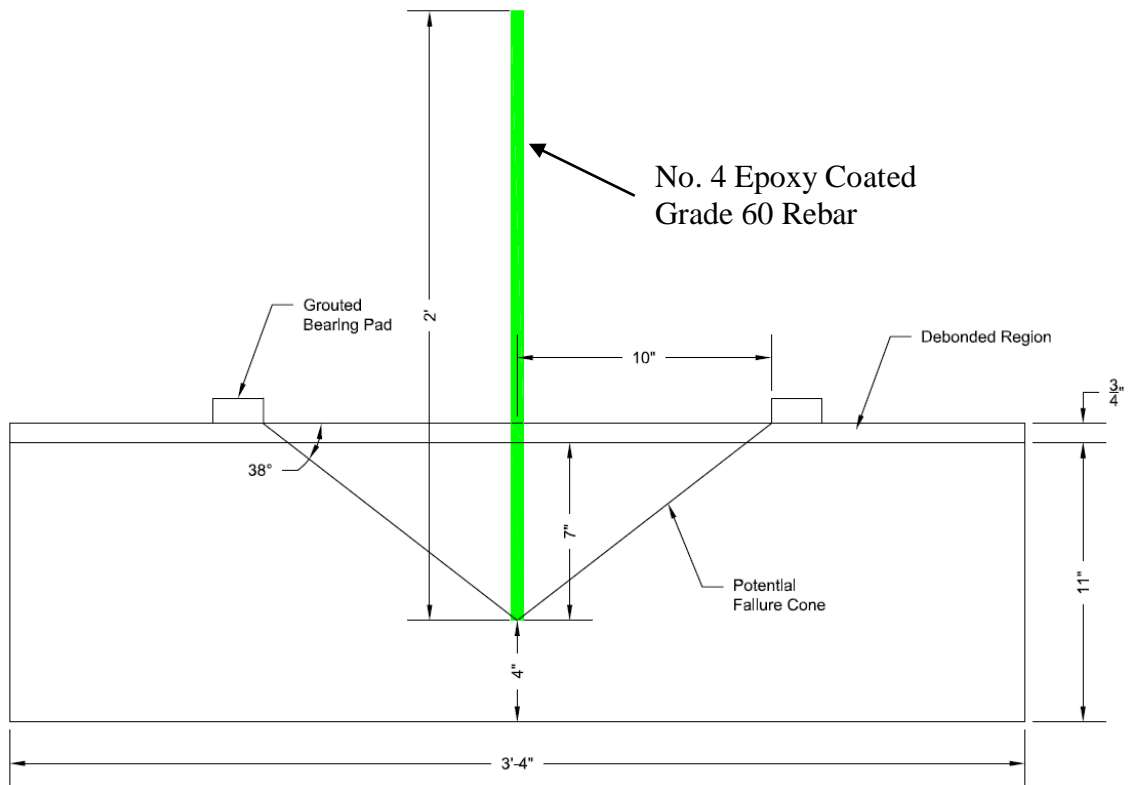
Side view of typical M-shaped subassembly specimen including grouted bearing pads and potential failure cone.
